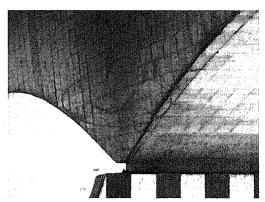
Cracks in Rama 7 (Web of main girder)
